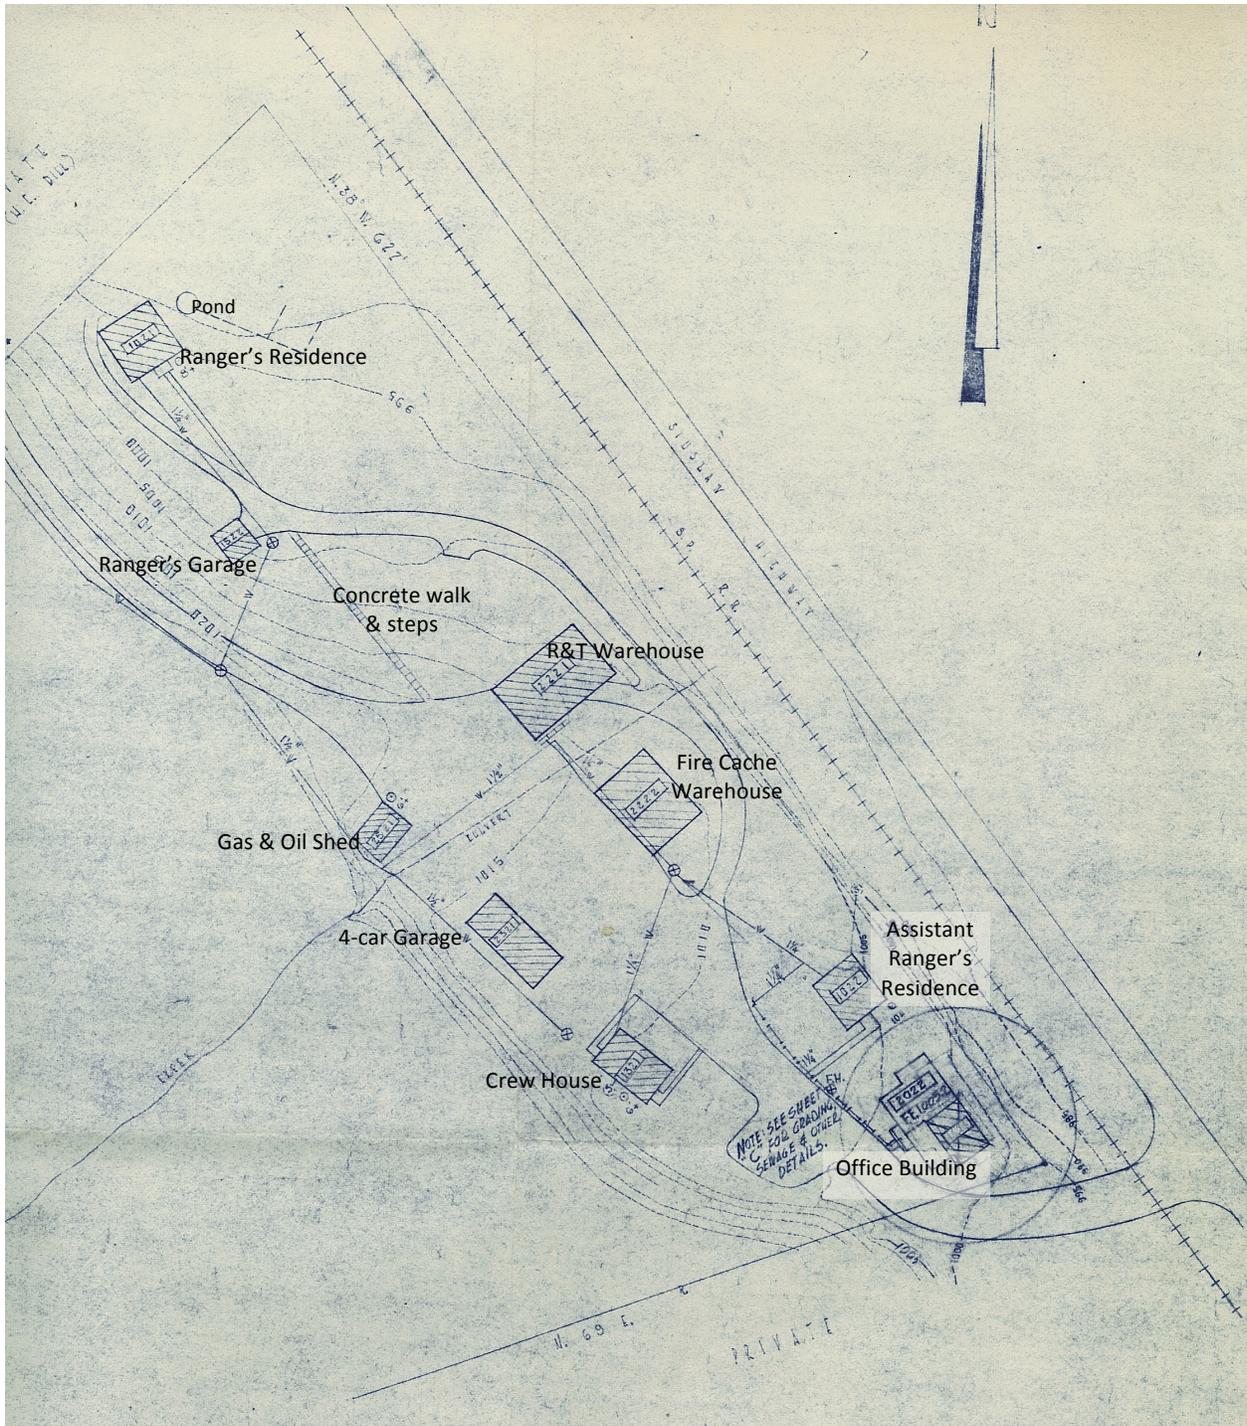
Site plan of Mapleton Ranger Station, 1958.
